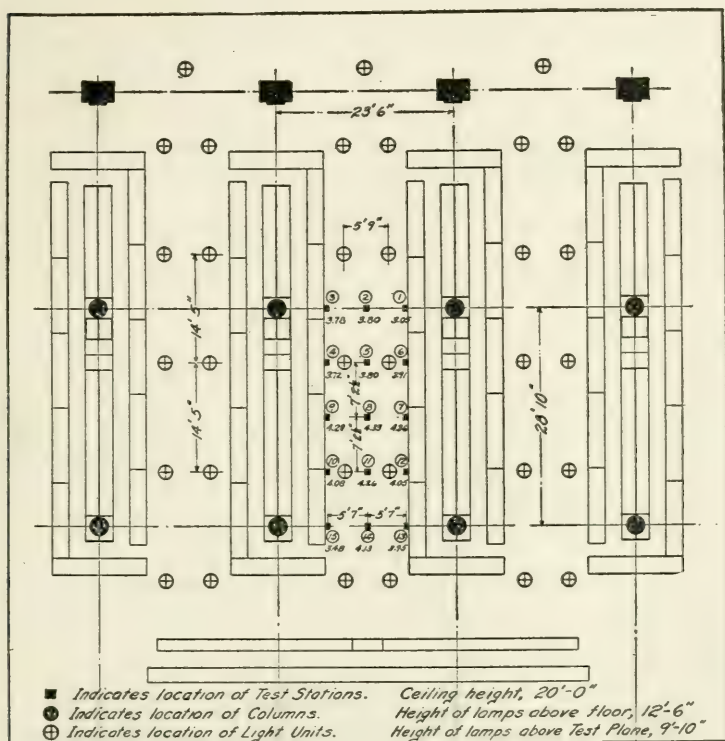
Section plan of first floor showing location of illumination test stations.
